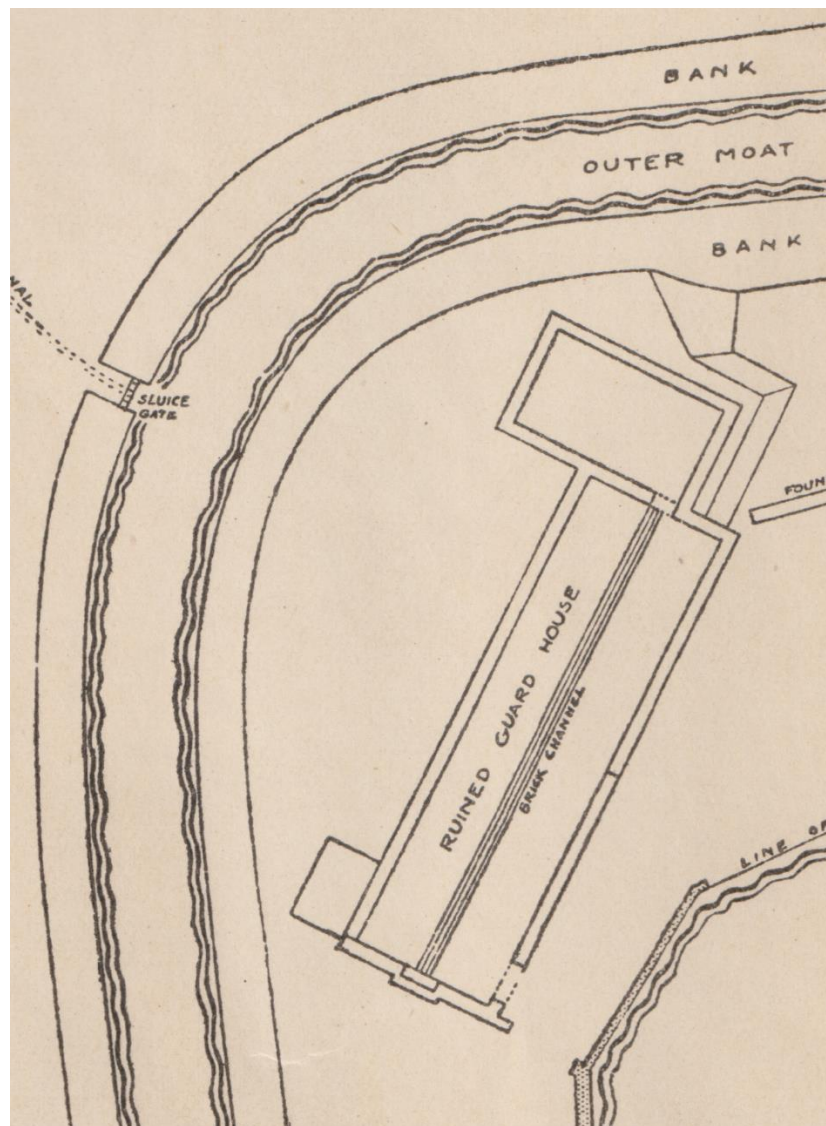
Detail of Weir's 1914 plan showing the excavated remains of the building. Note the central brick channel (Picture Source: Curzon & Tipping 1929)
